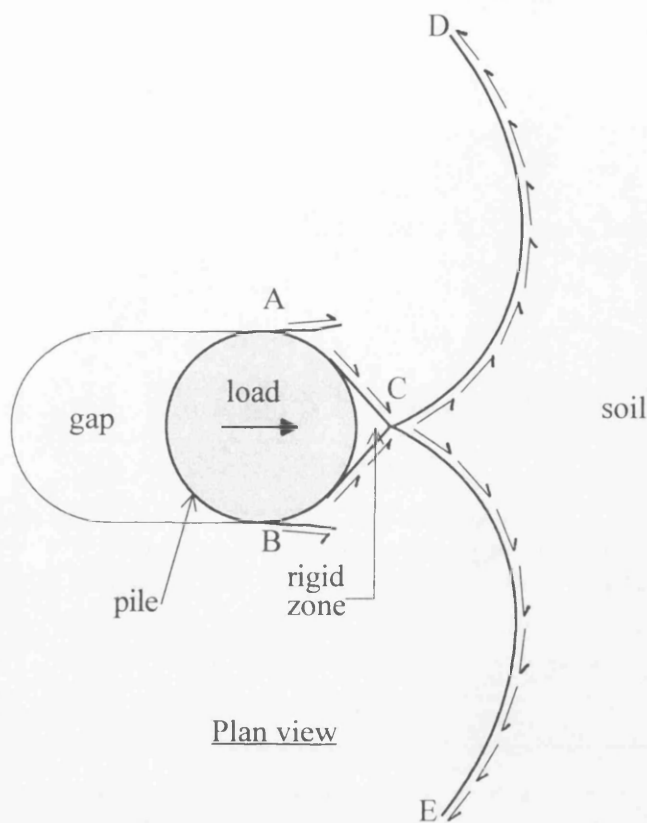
Failure mechanism of soil when a pile is loaded laterally.
